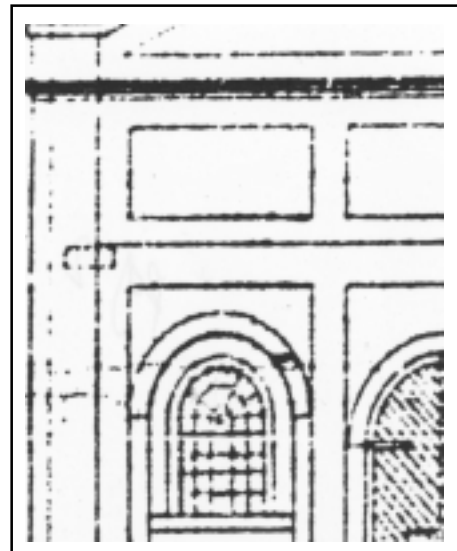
Elevation detail showing brick panels and detailing around windows. Source: SRAO ELW18
